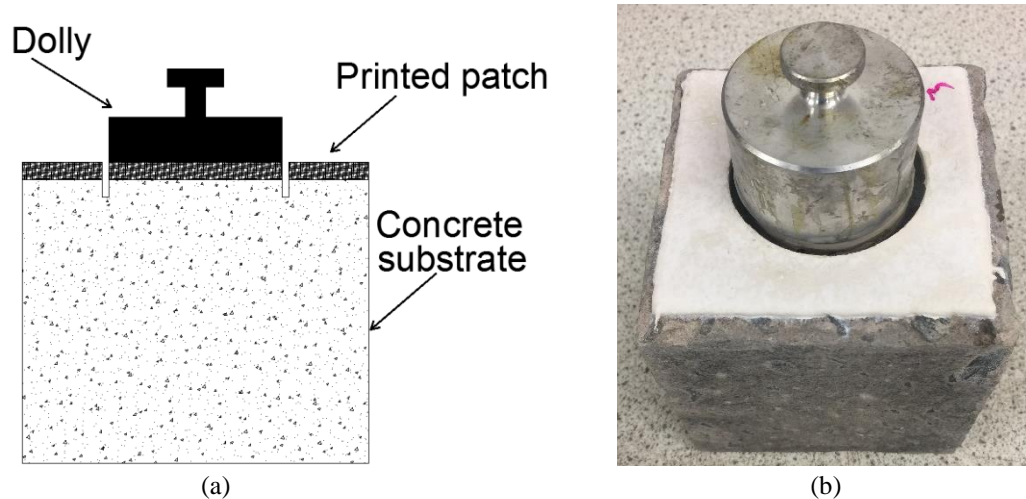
Printed overlay for adhesion test a) schematic drawing of sample b) picture of sample.
